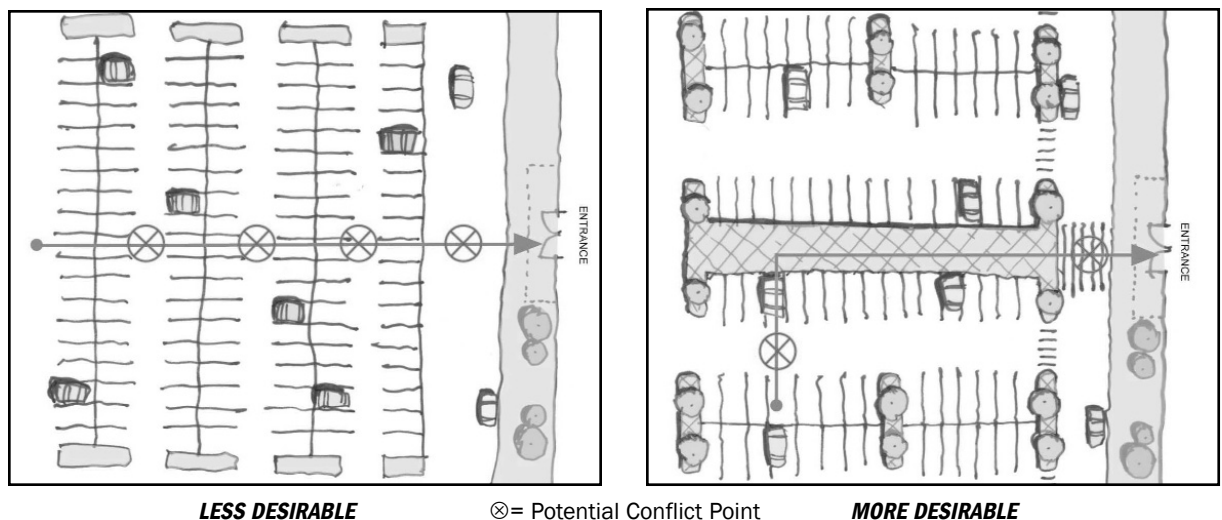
Parking modules should be oriented toward building entrances to reduce the number of conflict points.
